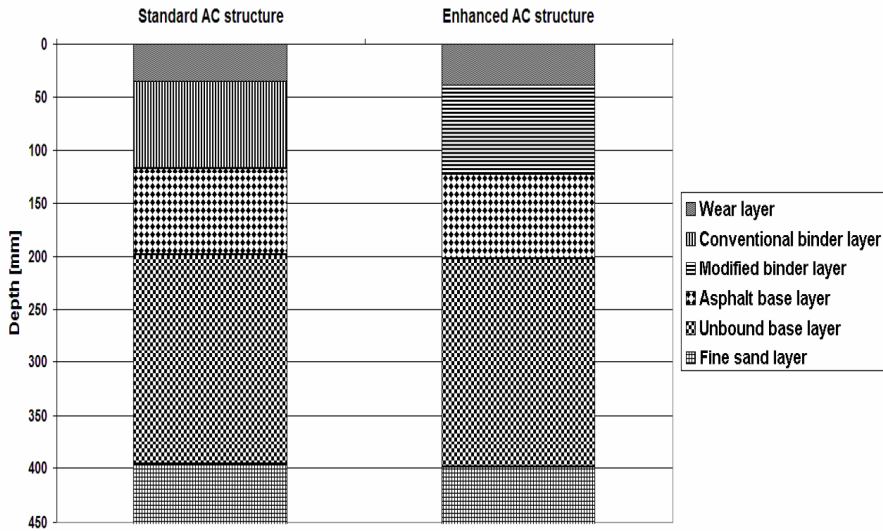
The pavement structure of the accelerated test sections (Paper I).
